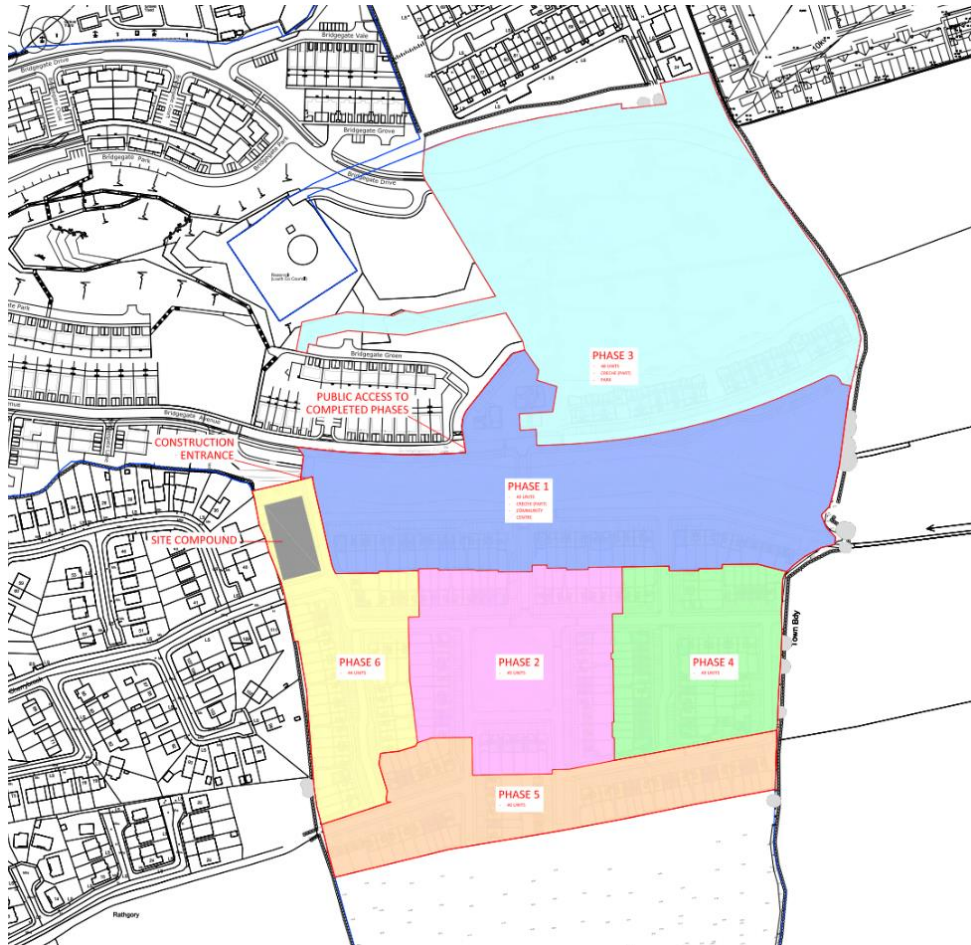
Extract of Phasing Plan (DA Drawing no. PA-003)
